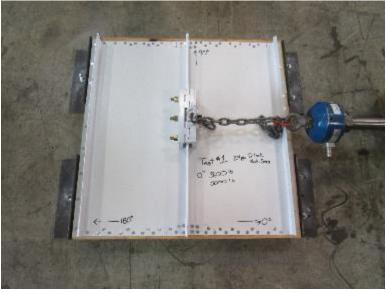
Typical Setup for Test Perpendicular to Direction of Standing Seam Roof
